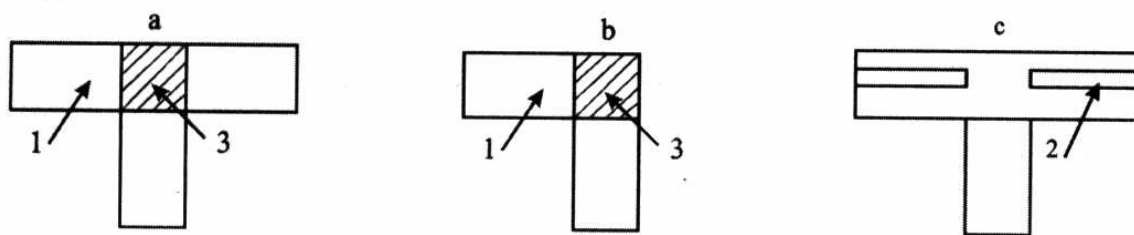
Thermal bridges at the intersection of transversal and longitudinal walls
